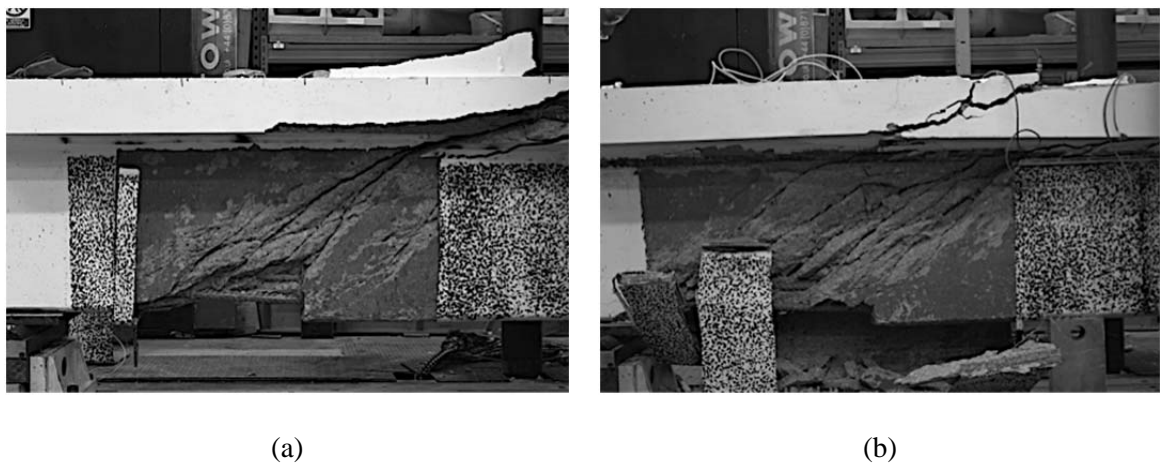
Heavily strengthened beam failure modes: (a) specimen LB2U, (b) specimen LB2UA.
